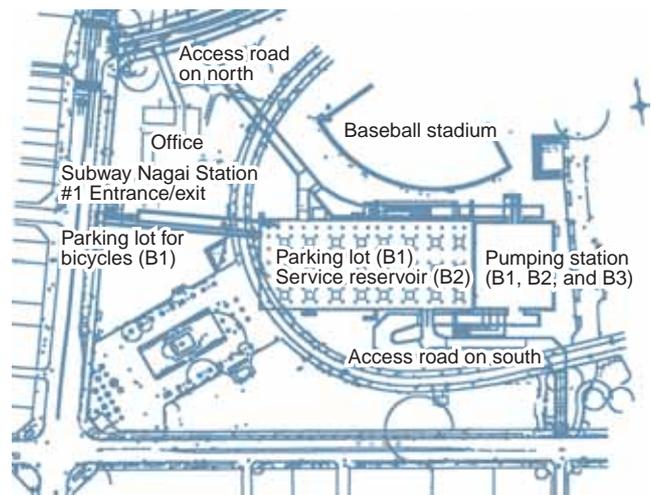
Top view of Nagai Distribution Plant/ underground parking facility
